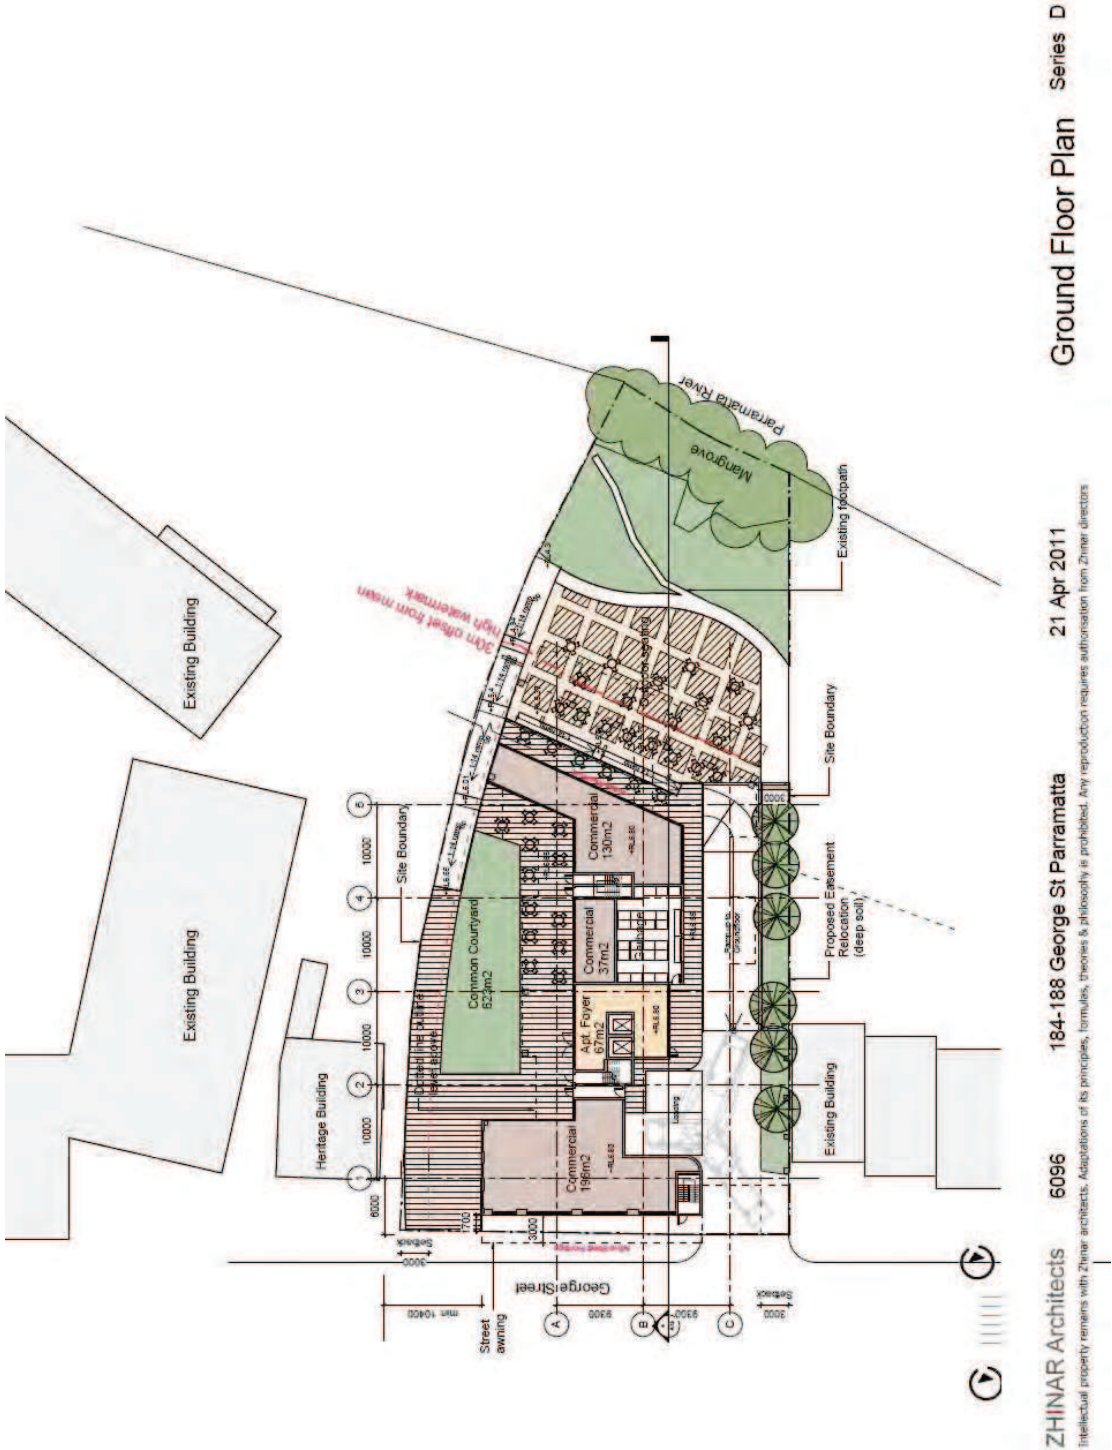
Proposed Development, 184-188 George Street, Parramatta, Ground Floor.
